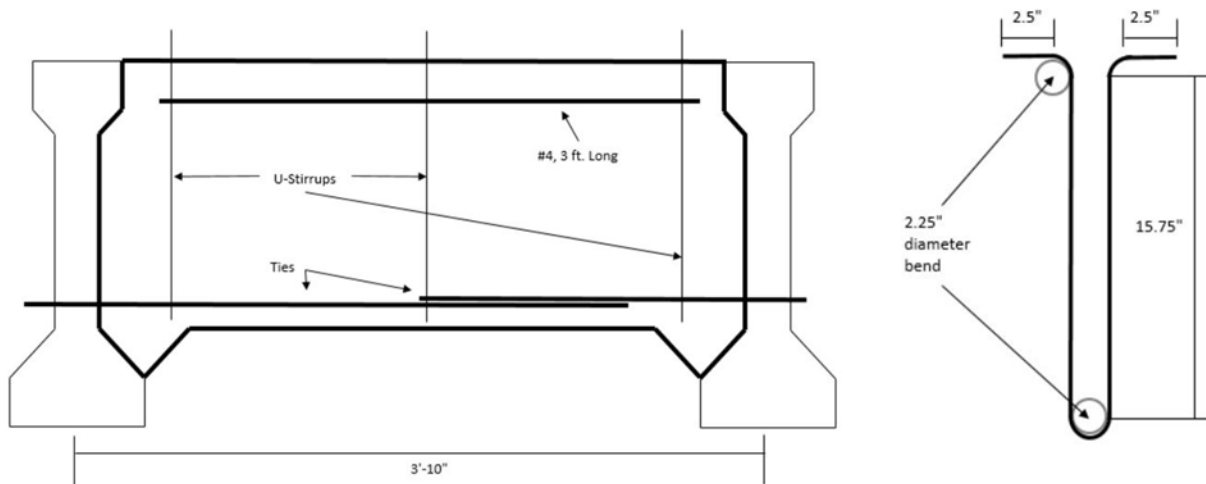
Diaphragm reinforcement for scaled bridge section and U-stirrup detail
